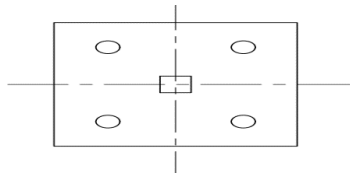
16. 2D plan of a rectangular pile cap on piles (Ashraf, 2018)
